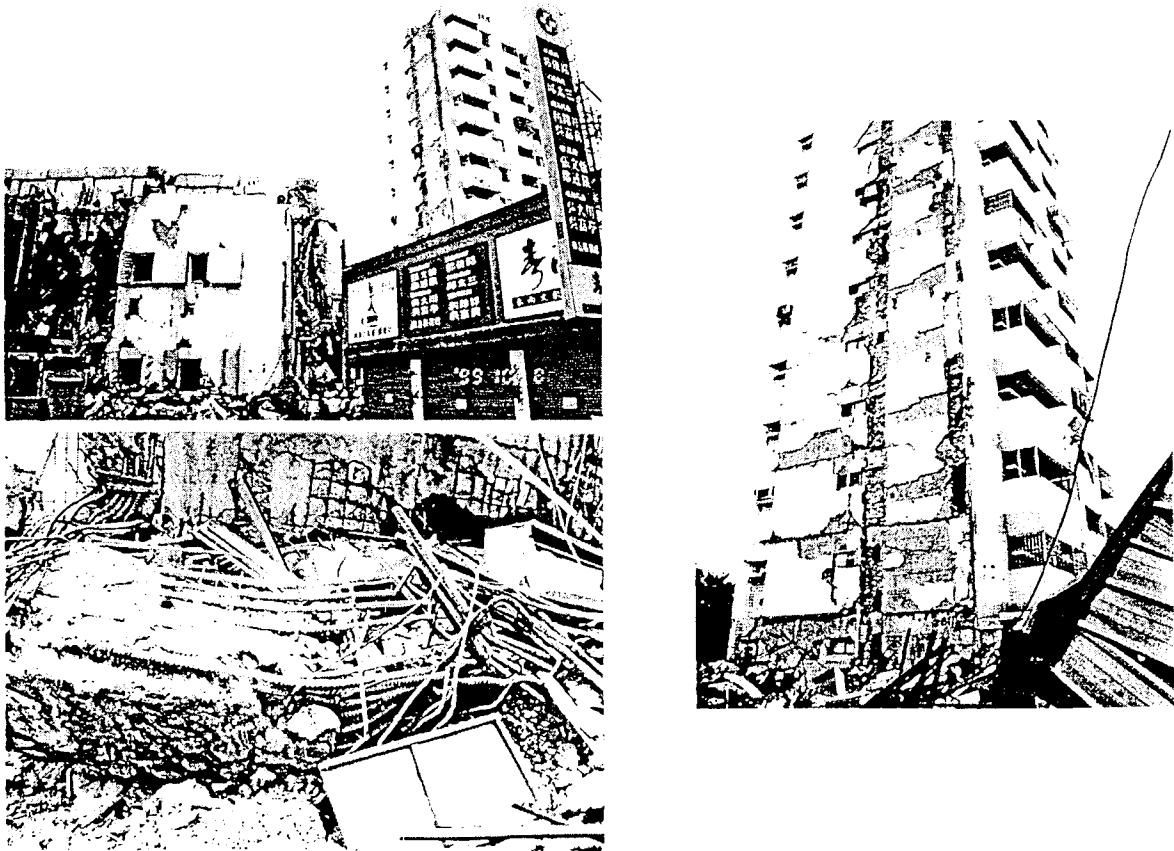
Damage of high-rise residential building (Fengyuan City, Taichung County)
